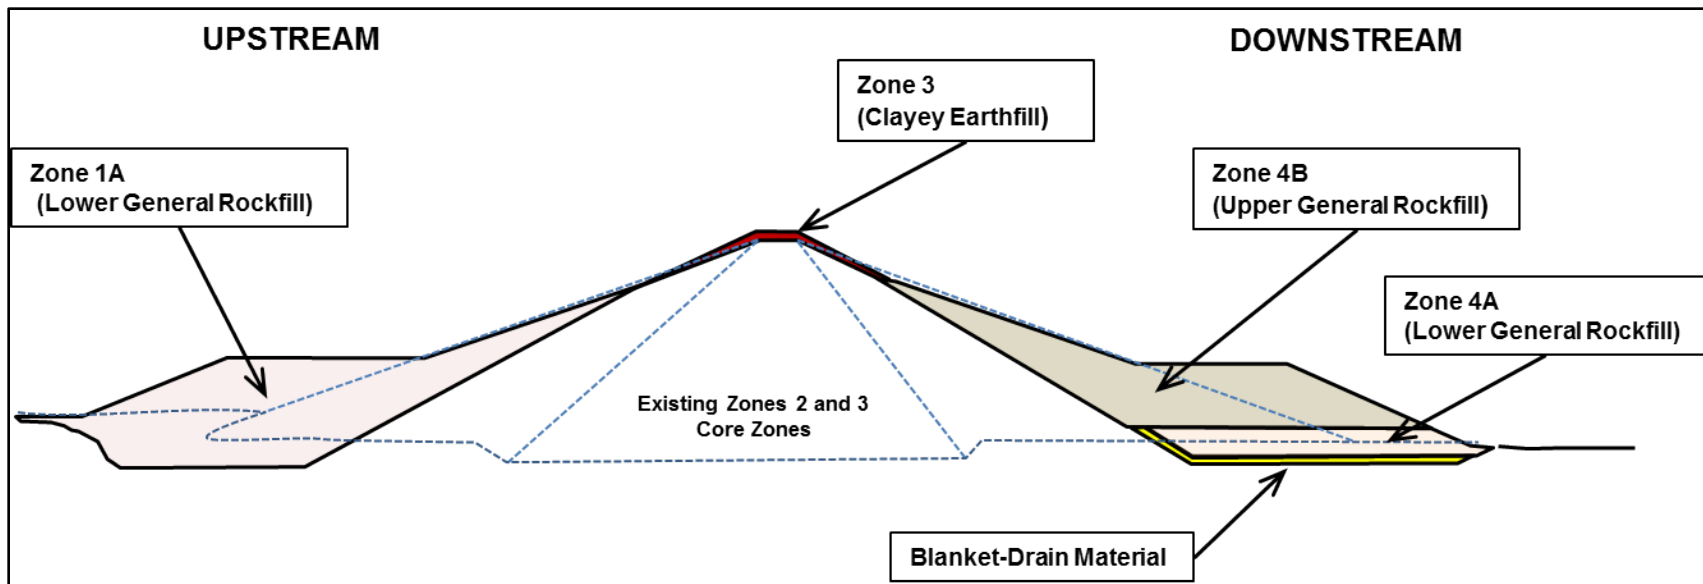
Conceptual Cross-Section of the Staff Recommended Alternative as Outlined in the Planning Study Report
